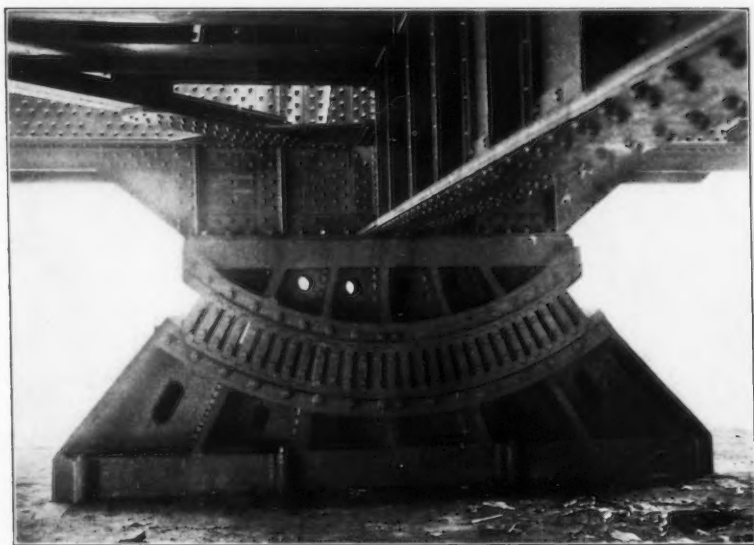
CAST-STEEL BEARINGS FOR TOWER POSTS.
